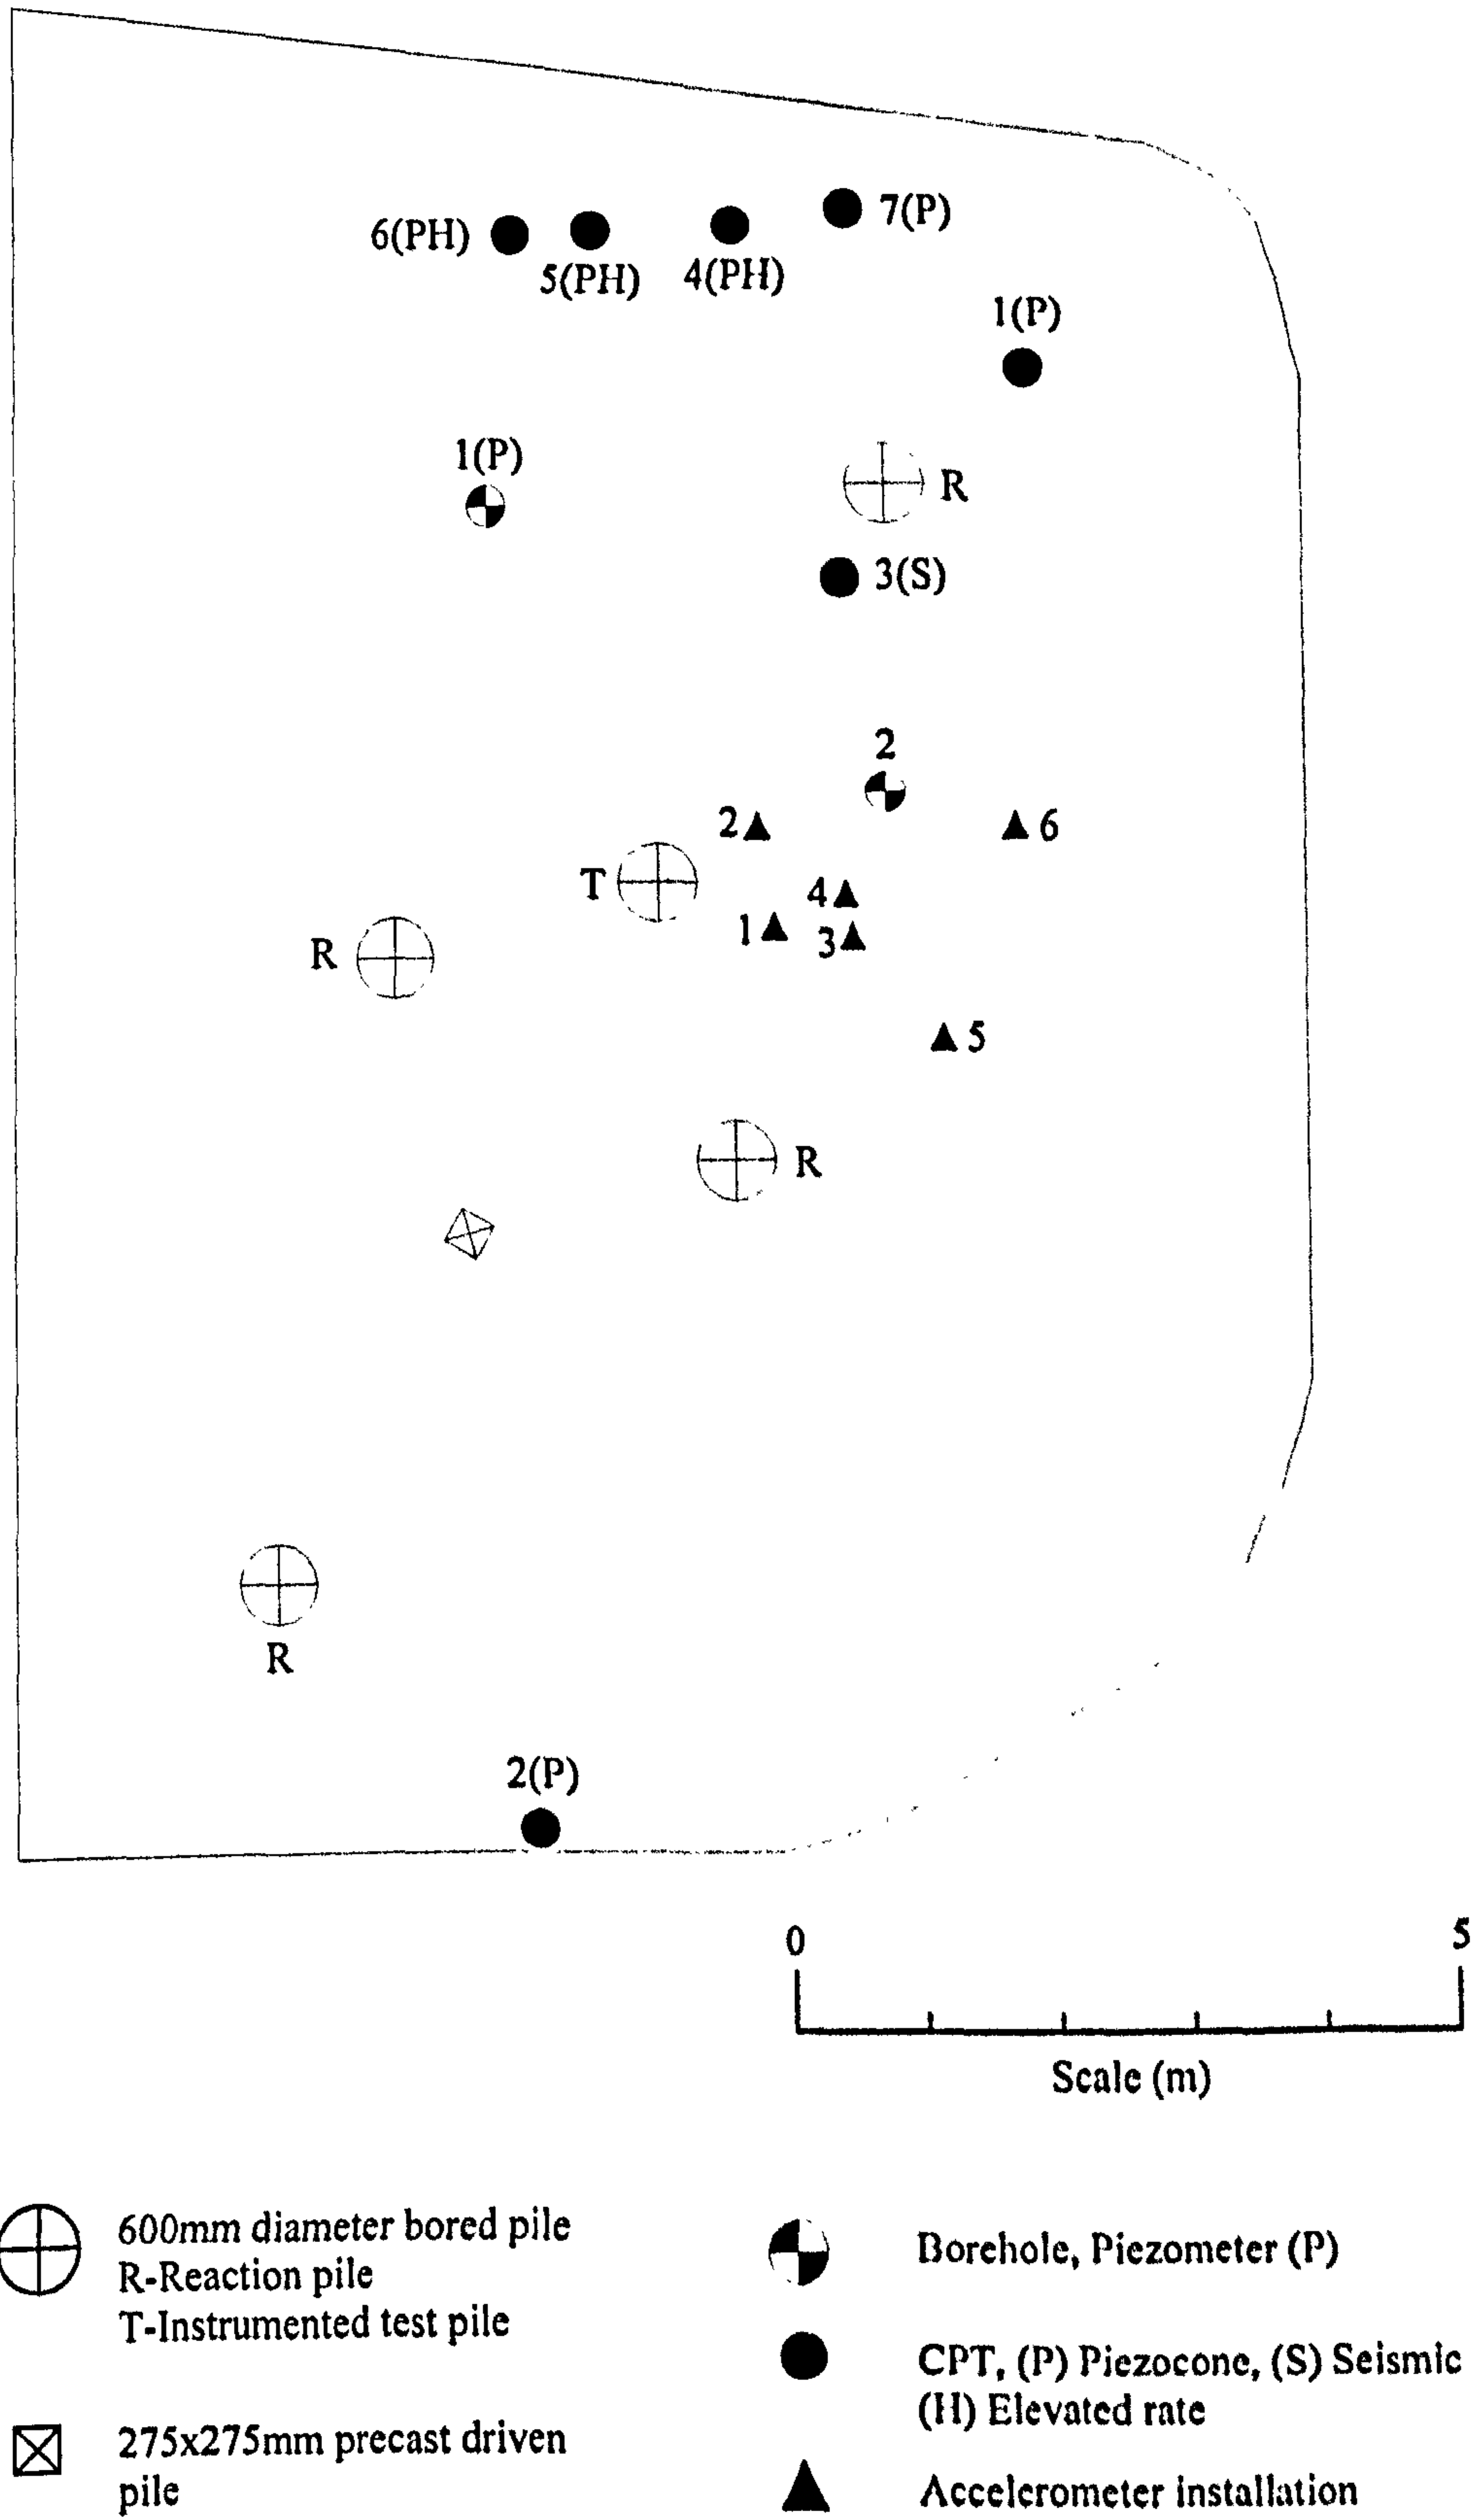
, Detailed plan of Grimsby research site showing test and installation positions.
